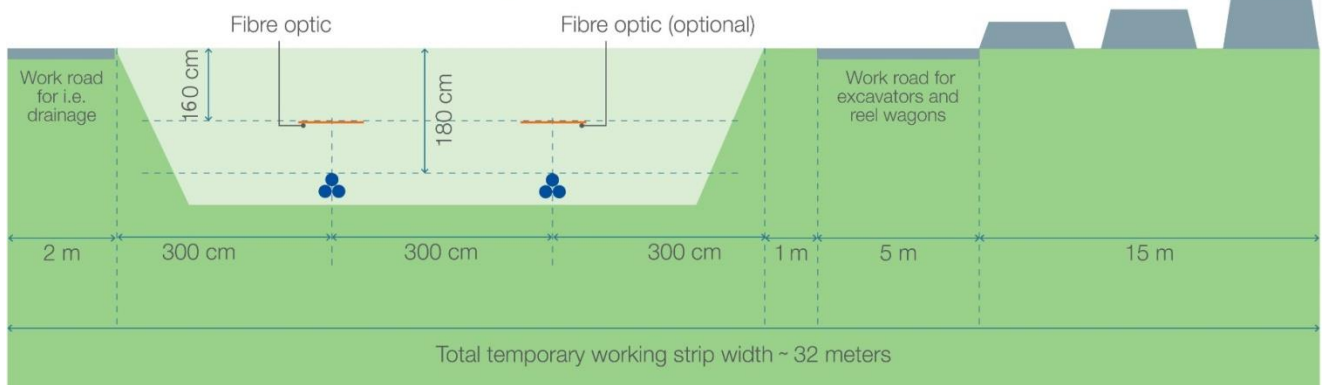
Typical example working area for the two different kind of trench types (525 kV HVDC and 380 kV HVAC connection)
